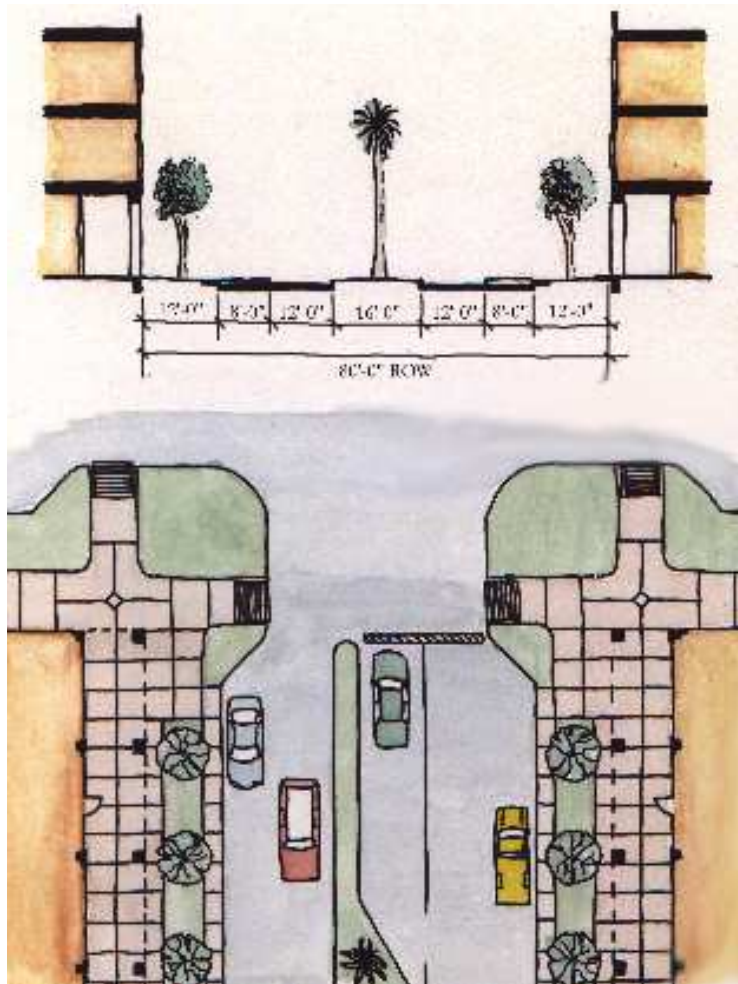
Two Lane Proposed Plan and Profile of Westgate Avenue
